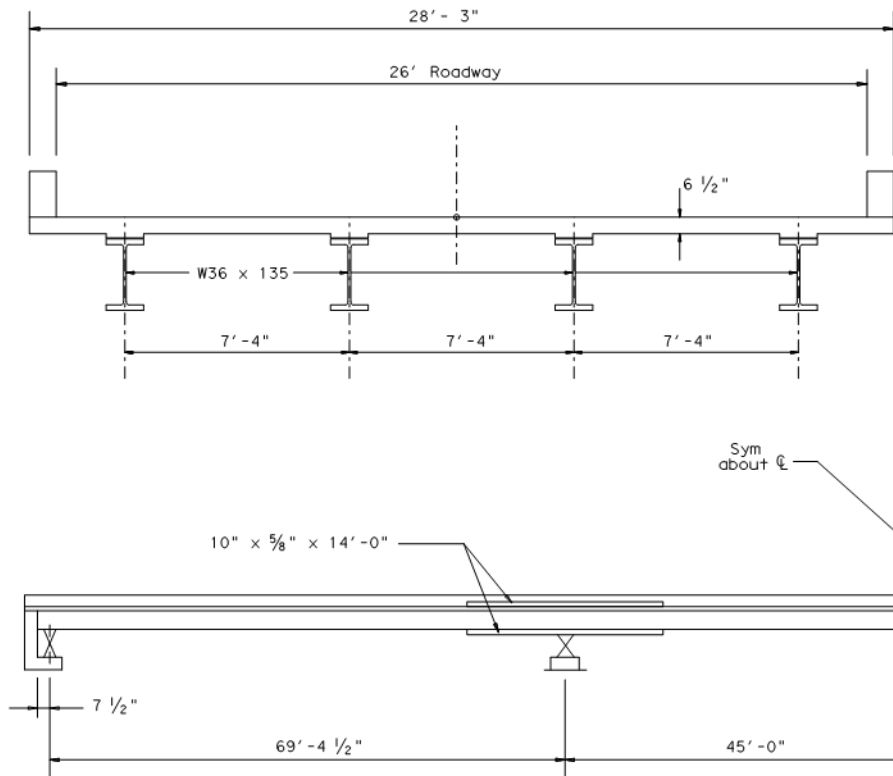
Typical Continuous I-Beam Bridge Elevation and Cross Section
